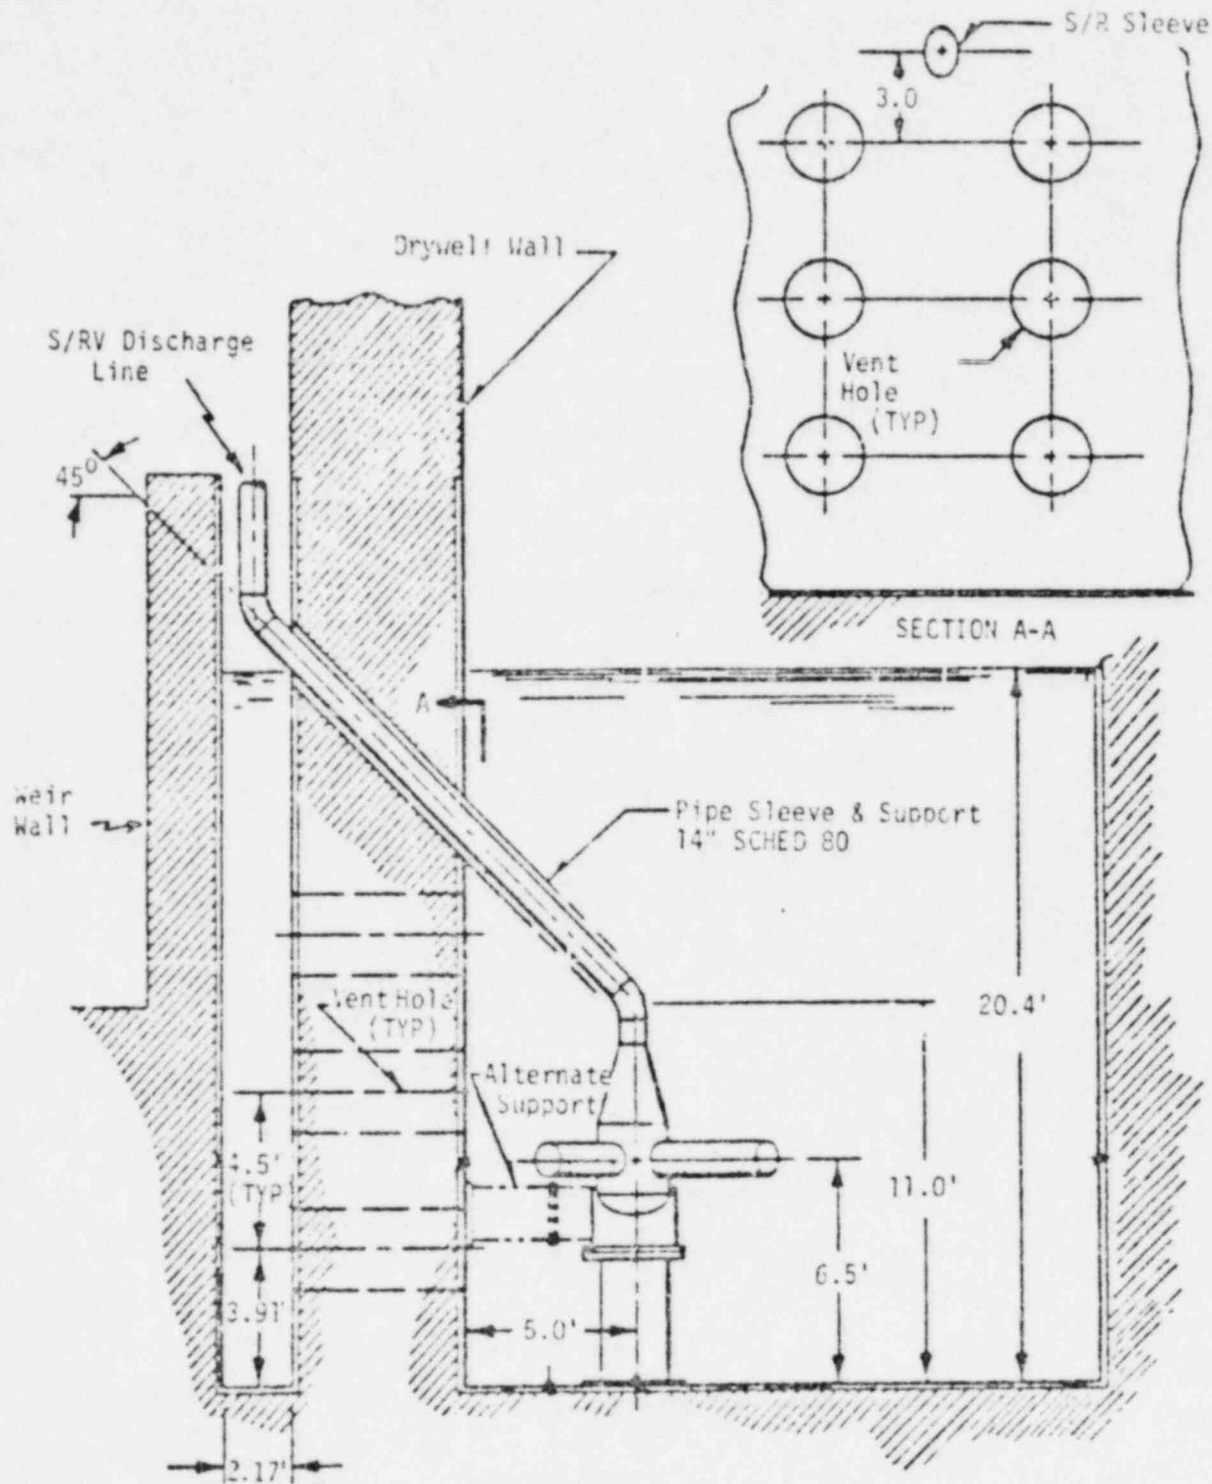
Standard Mark III 238 Quencher Arrangement Elevation
